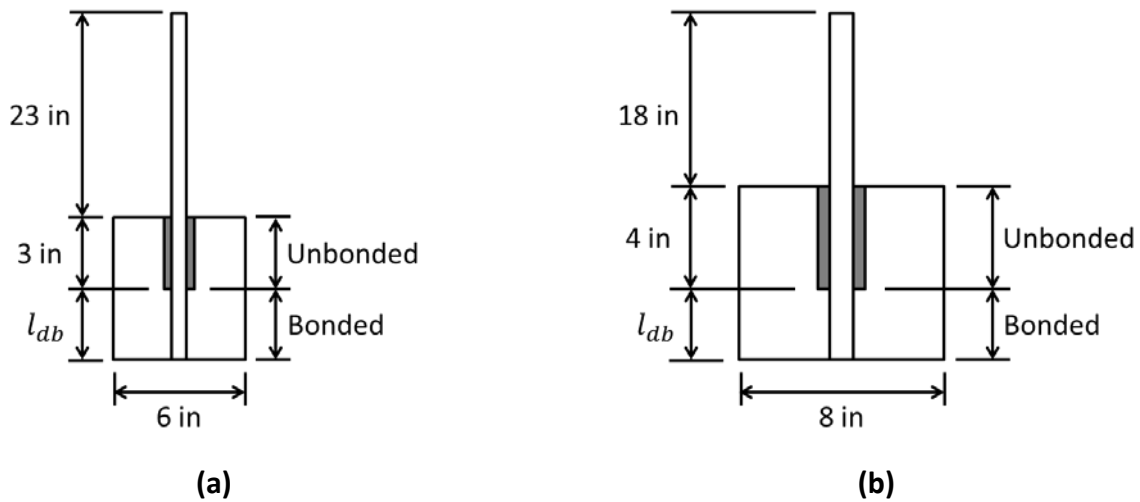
Pull-out test specimens; (a) No. 5 bars, and (b) No. 8 Bars.
